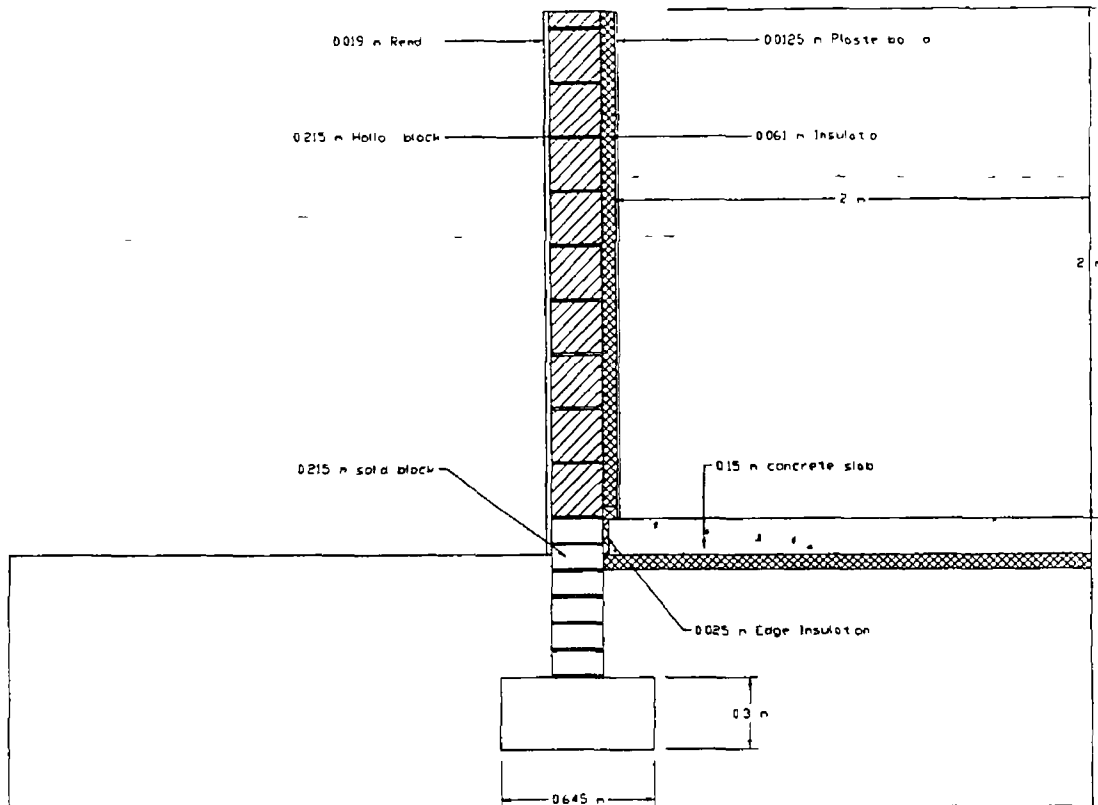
Semi-Detached House Foundation, Floor and External Wall
